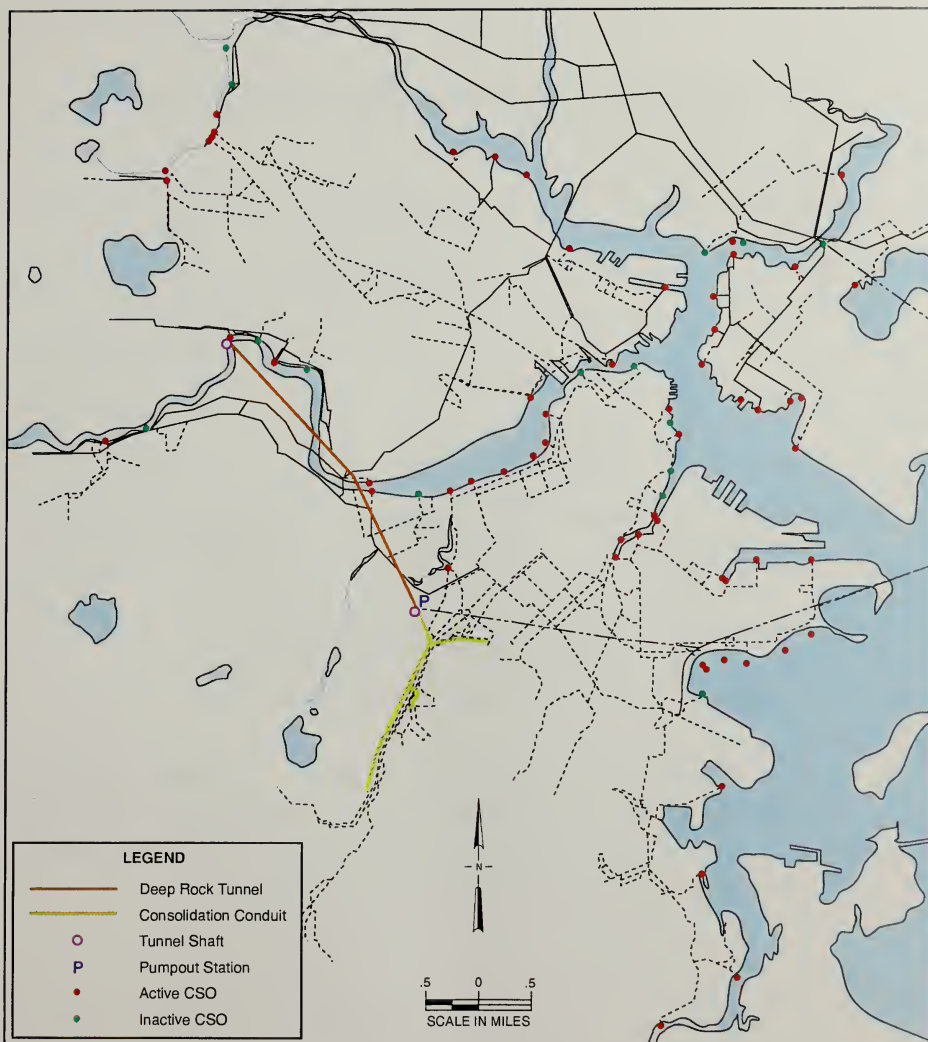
CSO TUNNEL PLAN FOR 1-YEAR STORM
